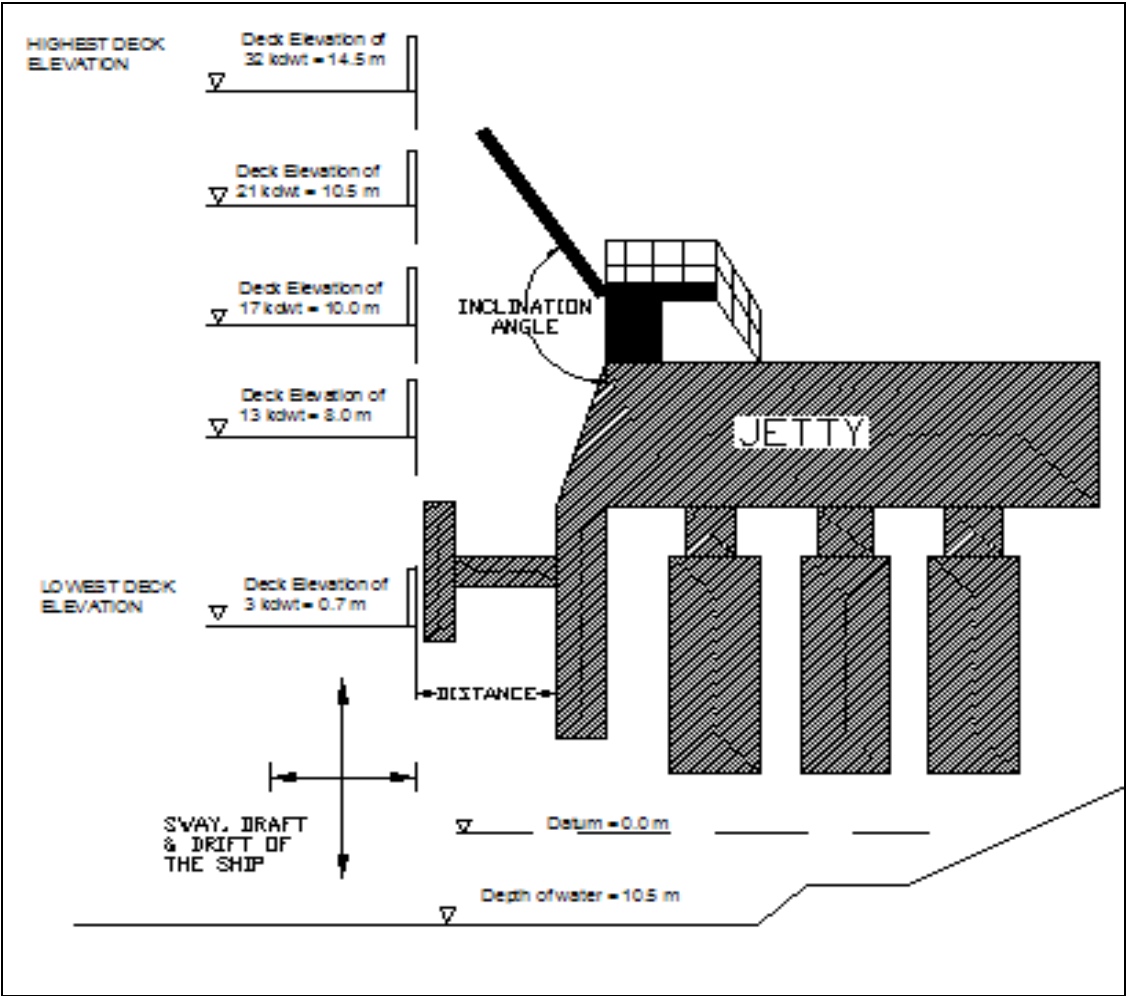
Illustration of deck elevations with respect to design vessel sizes
